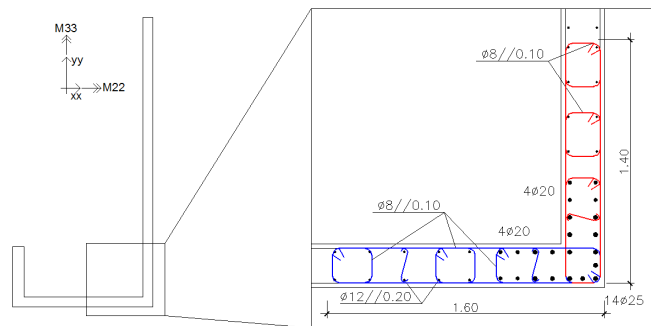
Detail of confinement reinforcement in section 3 of the core N3
